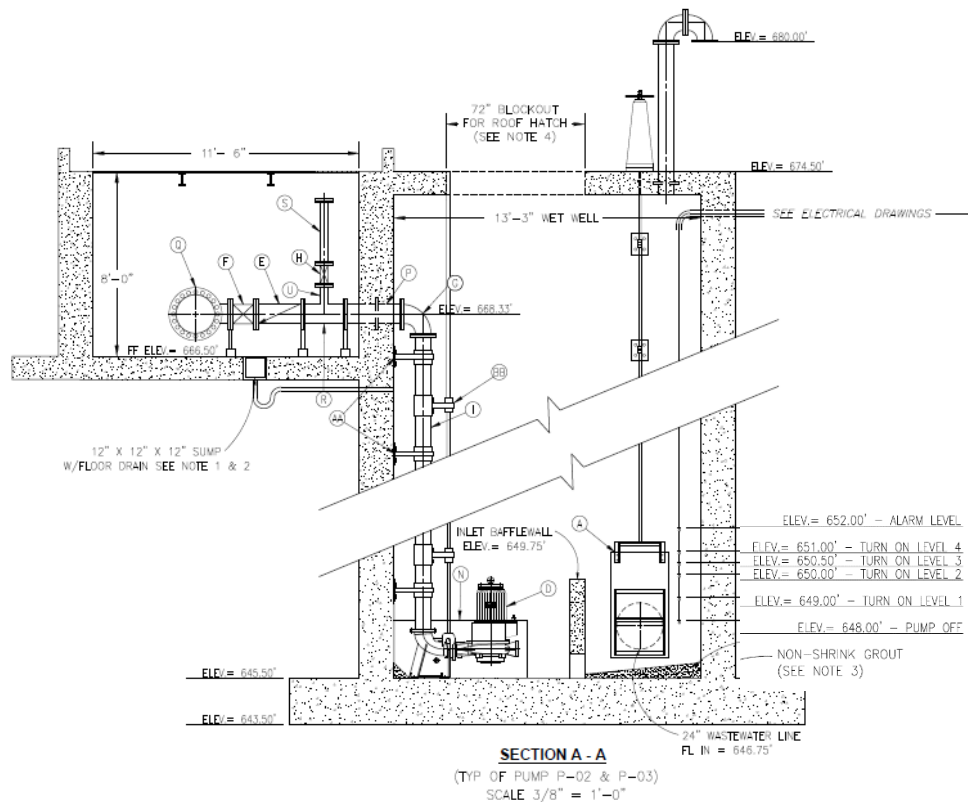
Proposed Lift Station Wet Well Pump On/Off Elevations
